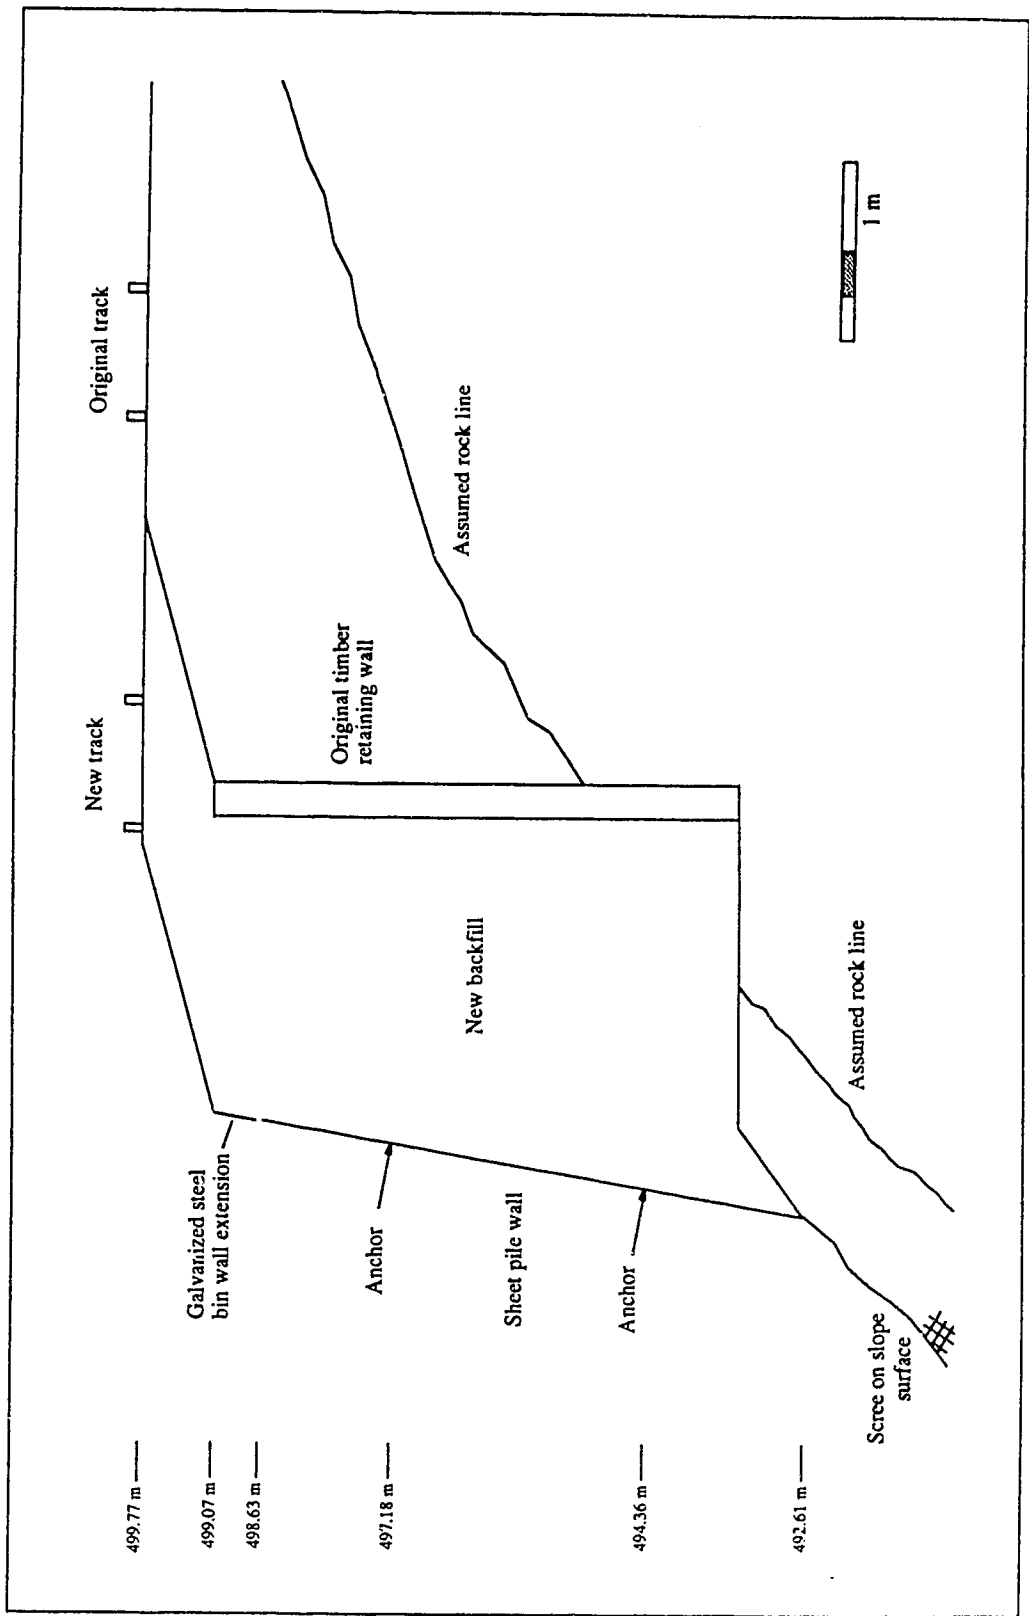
Cross section at the reference sheet pile joint of the east wall.
